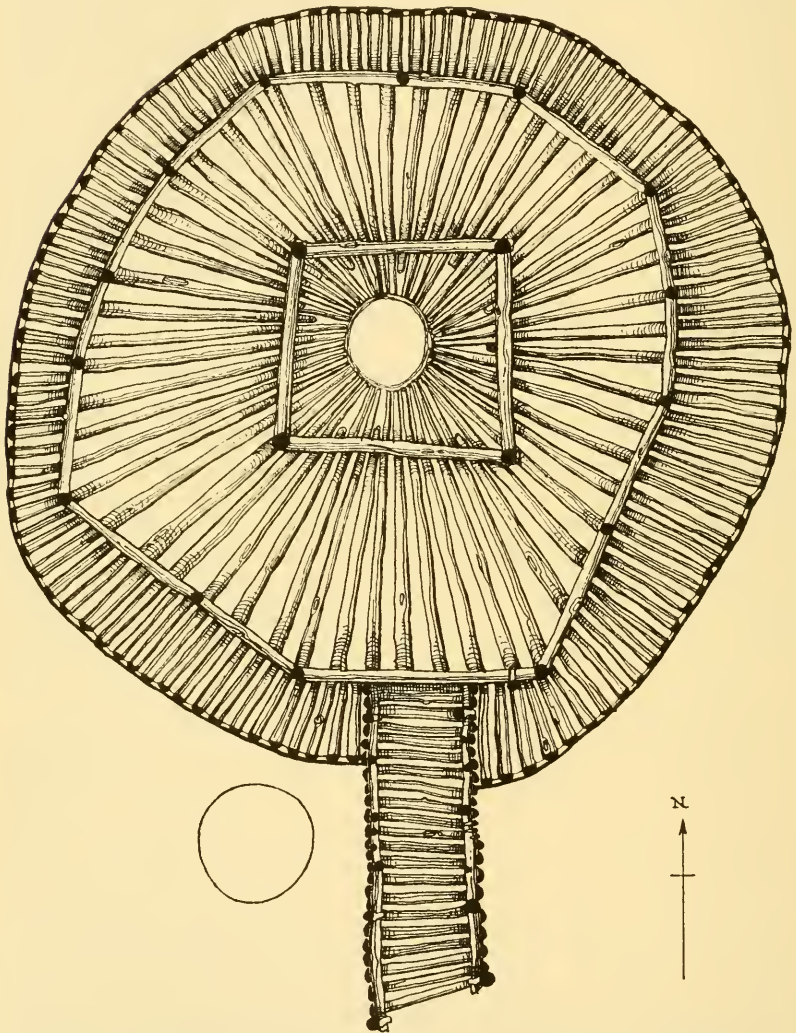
Reconstructed view of timber construction, same Arikara earth lodge, Leavenworth site.
